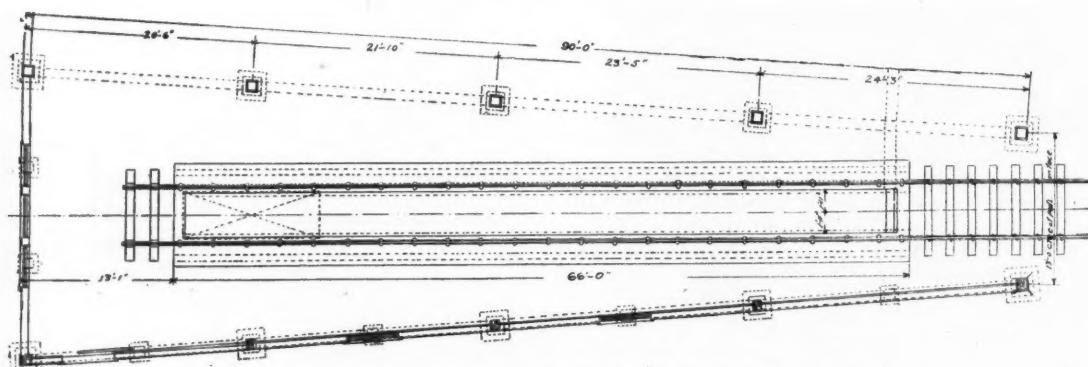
SECTION AND PLAN OF ROUNDHOUSE, C. R. I. & P. RY.
